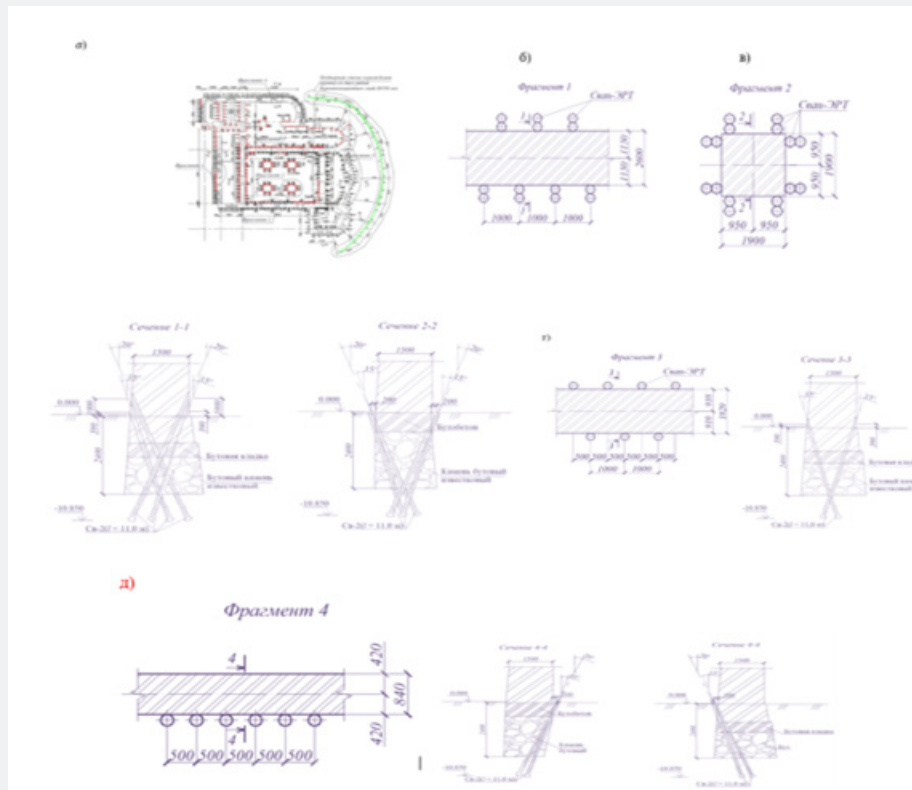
Scheme of the location of bored piles when strengthening the base and foundations of the Vvedensky Cathedral. Symbols: dots of red and black colors - bored piles reinforcing the base and foundation; green points - bored piles of the retaining wall on the eastern side of the temple: a - plan of piles - EDT, b, c, d, e - fragments with sections 1-1, 2-2, 3-3, 4-4.
